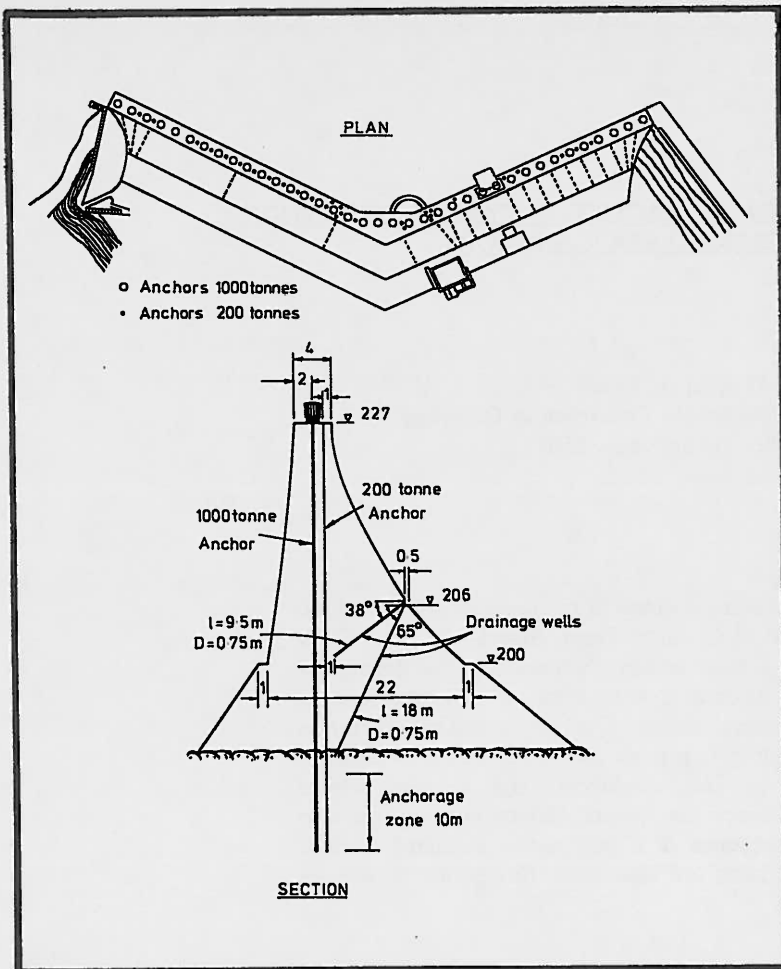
Layout of anchors to resist overturning, Cheurfas Dam, Algeria⁹.
